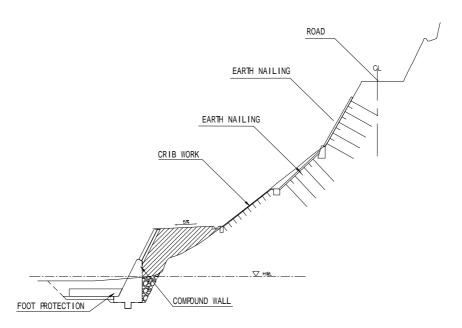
Countermeasures for slope failure due to scouring around STA.22+900
